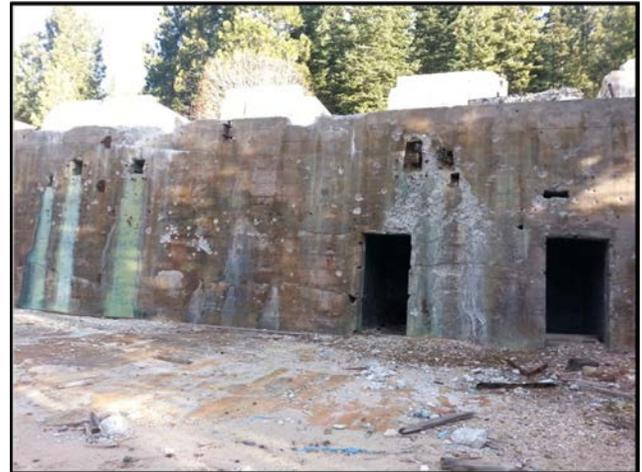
Upper concentrator plant foundations showing formation of copper oxides on the concrete foundations.
